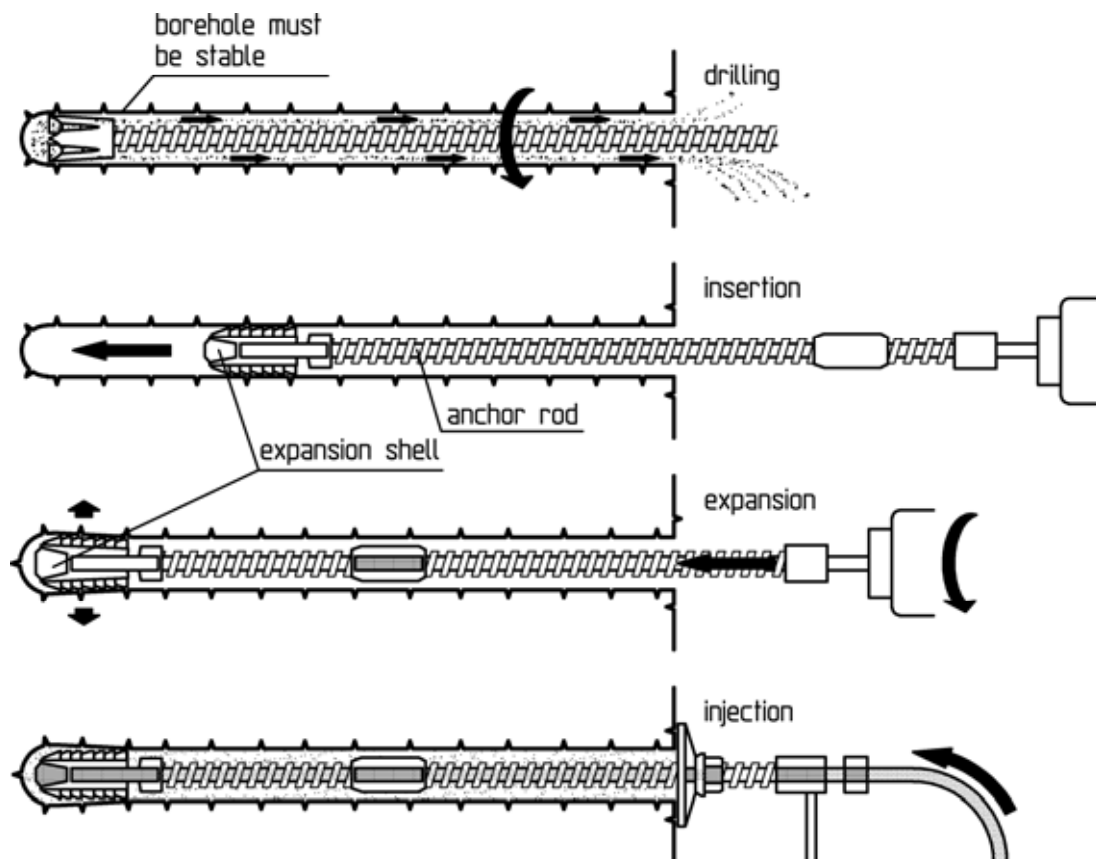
Installation of an expansion anchor constructed as an injection bolt (Ischebeck Titan Ltd.)
